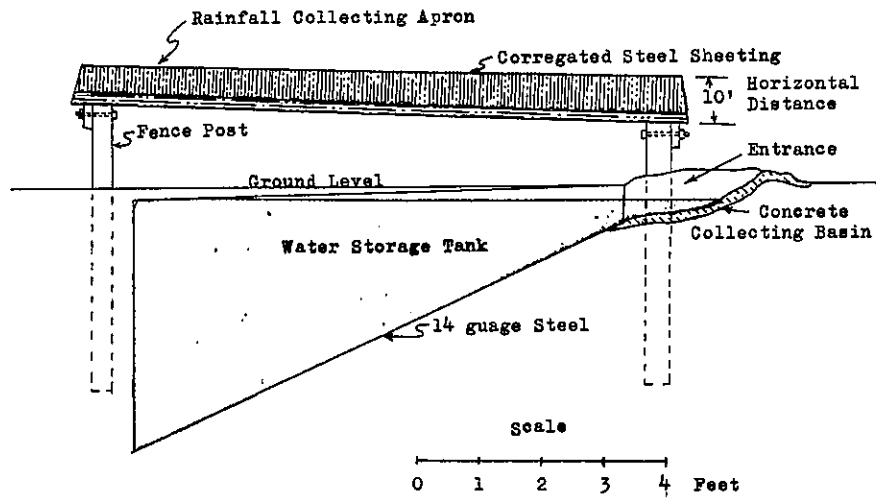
Line drawing showing vertical cross-section of a guzzler.
